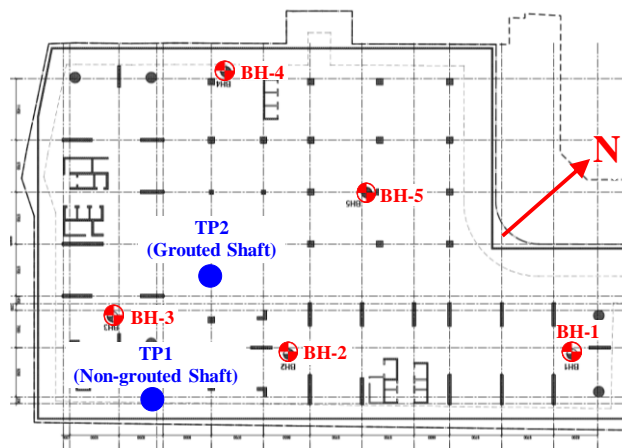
Layout of borings and the tested drilled shafts, TP1 and TP2
